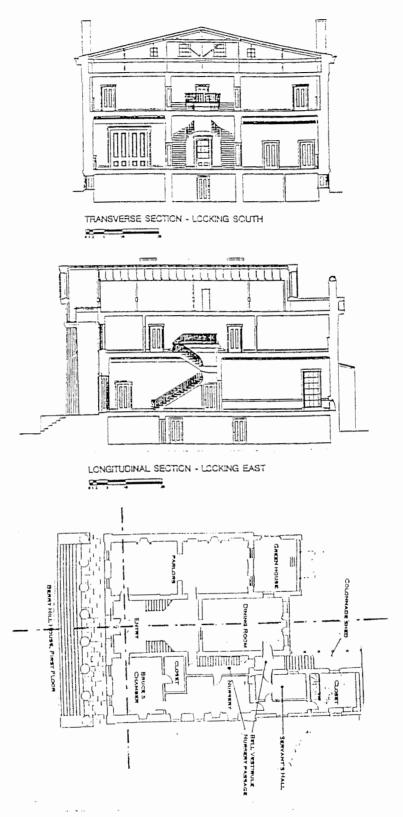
Berry Hill House. Plan and Cross Sections.
